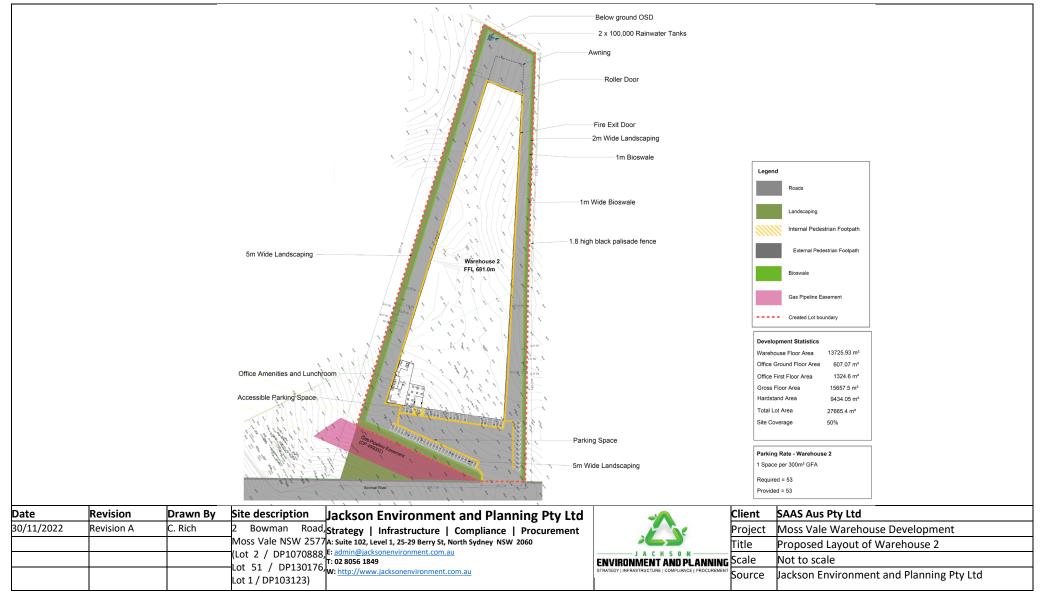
Proposed layout for Warehouse 2 on created Lot 2. High resolution plans are contained in Appendix 1.
